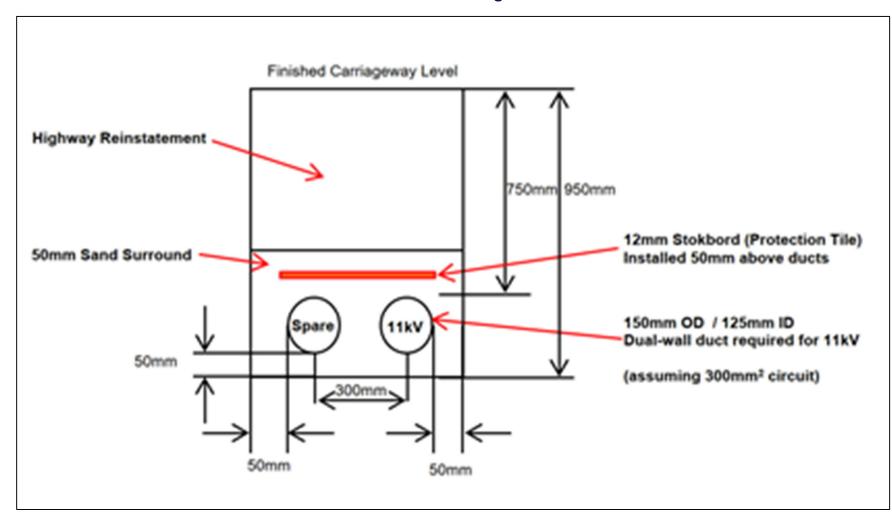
Indicative Cross-Sectional Sketch of a Road Crossing
